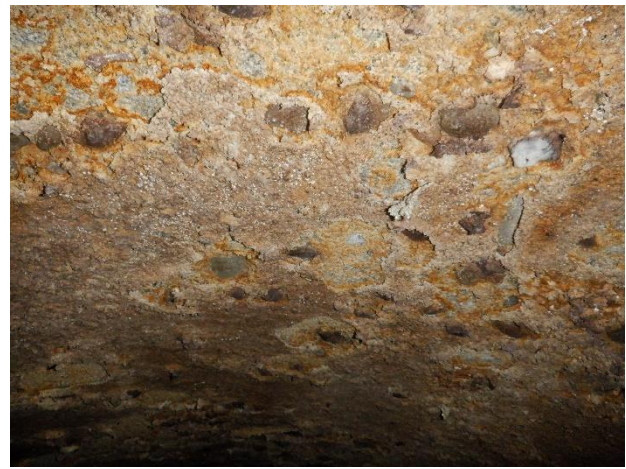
2. Upstream pipe, moderate surface damage and delamination of surface mortar lining on crown.
